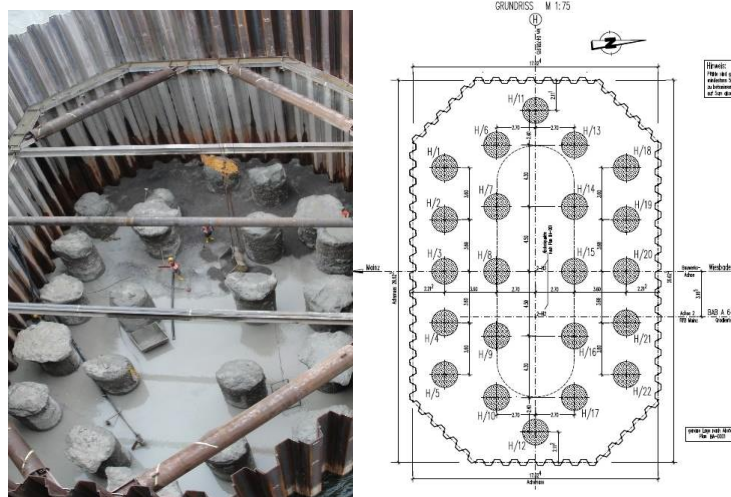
Sketch of the pile foundation (Samstag & Stremmel, 2016)
